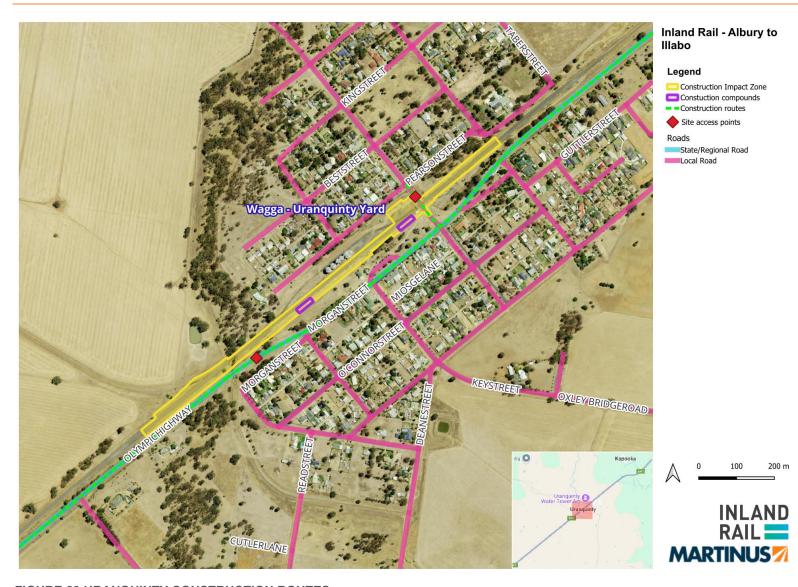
URANQUINTY CONSTRUCTION ROUTES
